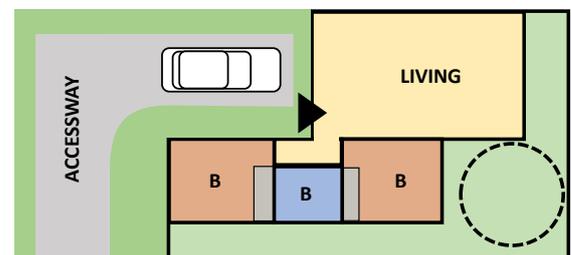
Example of a single-storey, two-bedroom dwelling without a garage.
